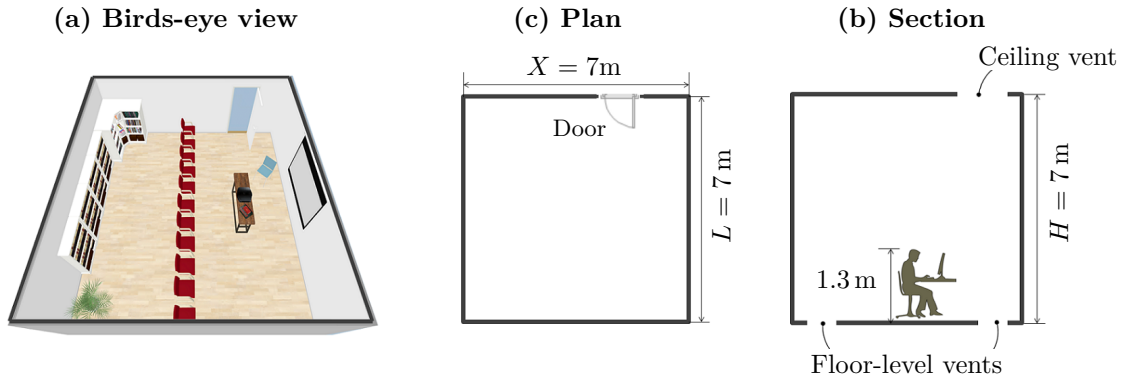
Drawings showing (a) a ‘birds-eye’ perspective, (b) a plan view, and (c) a section view of the naturally ventilated classroom. Ventilation openings at the ceiling and floor levels provide the primary connection between the internal and external (wind-free) environment. The seated head height of occupants is estimated to be at 1.3 m from the floor.
